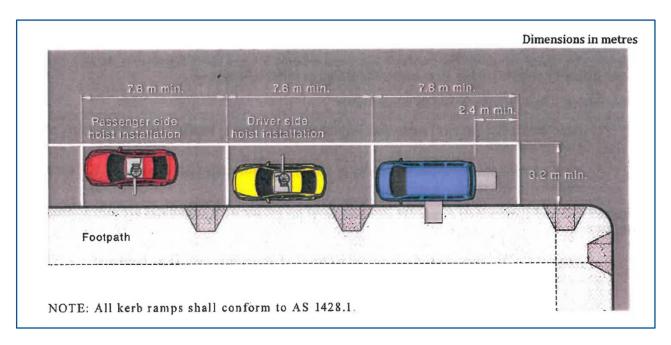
Examples of accessible parallel parking without kerb extensions (AS2890.5:2020)
